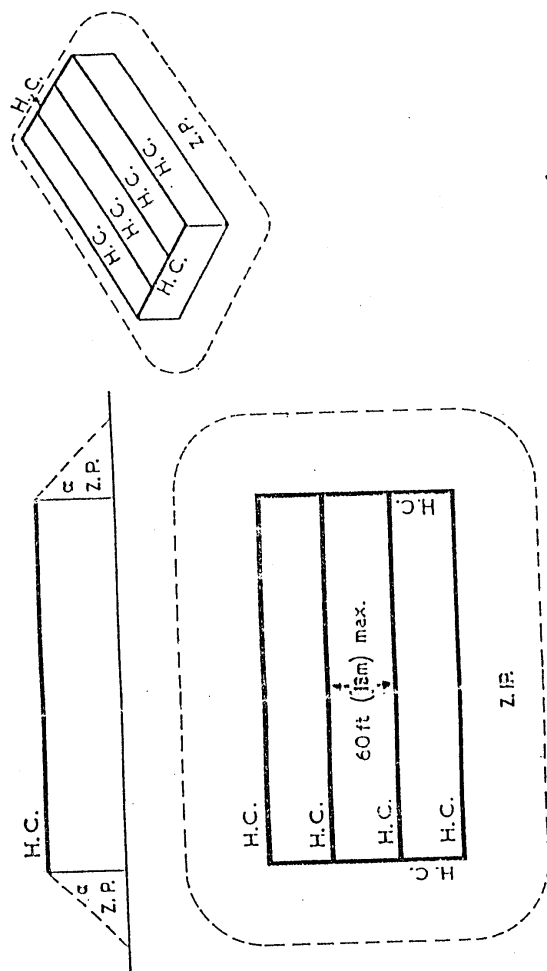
a Horizontal air termination network on a structure with large area of roof
